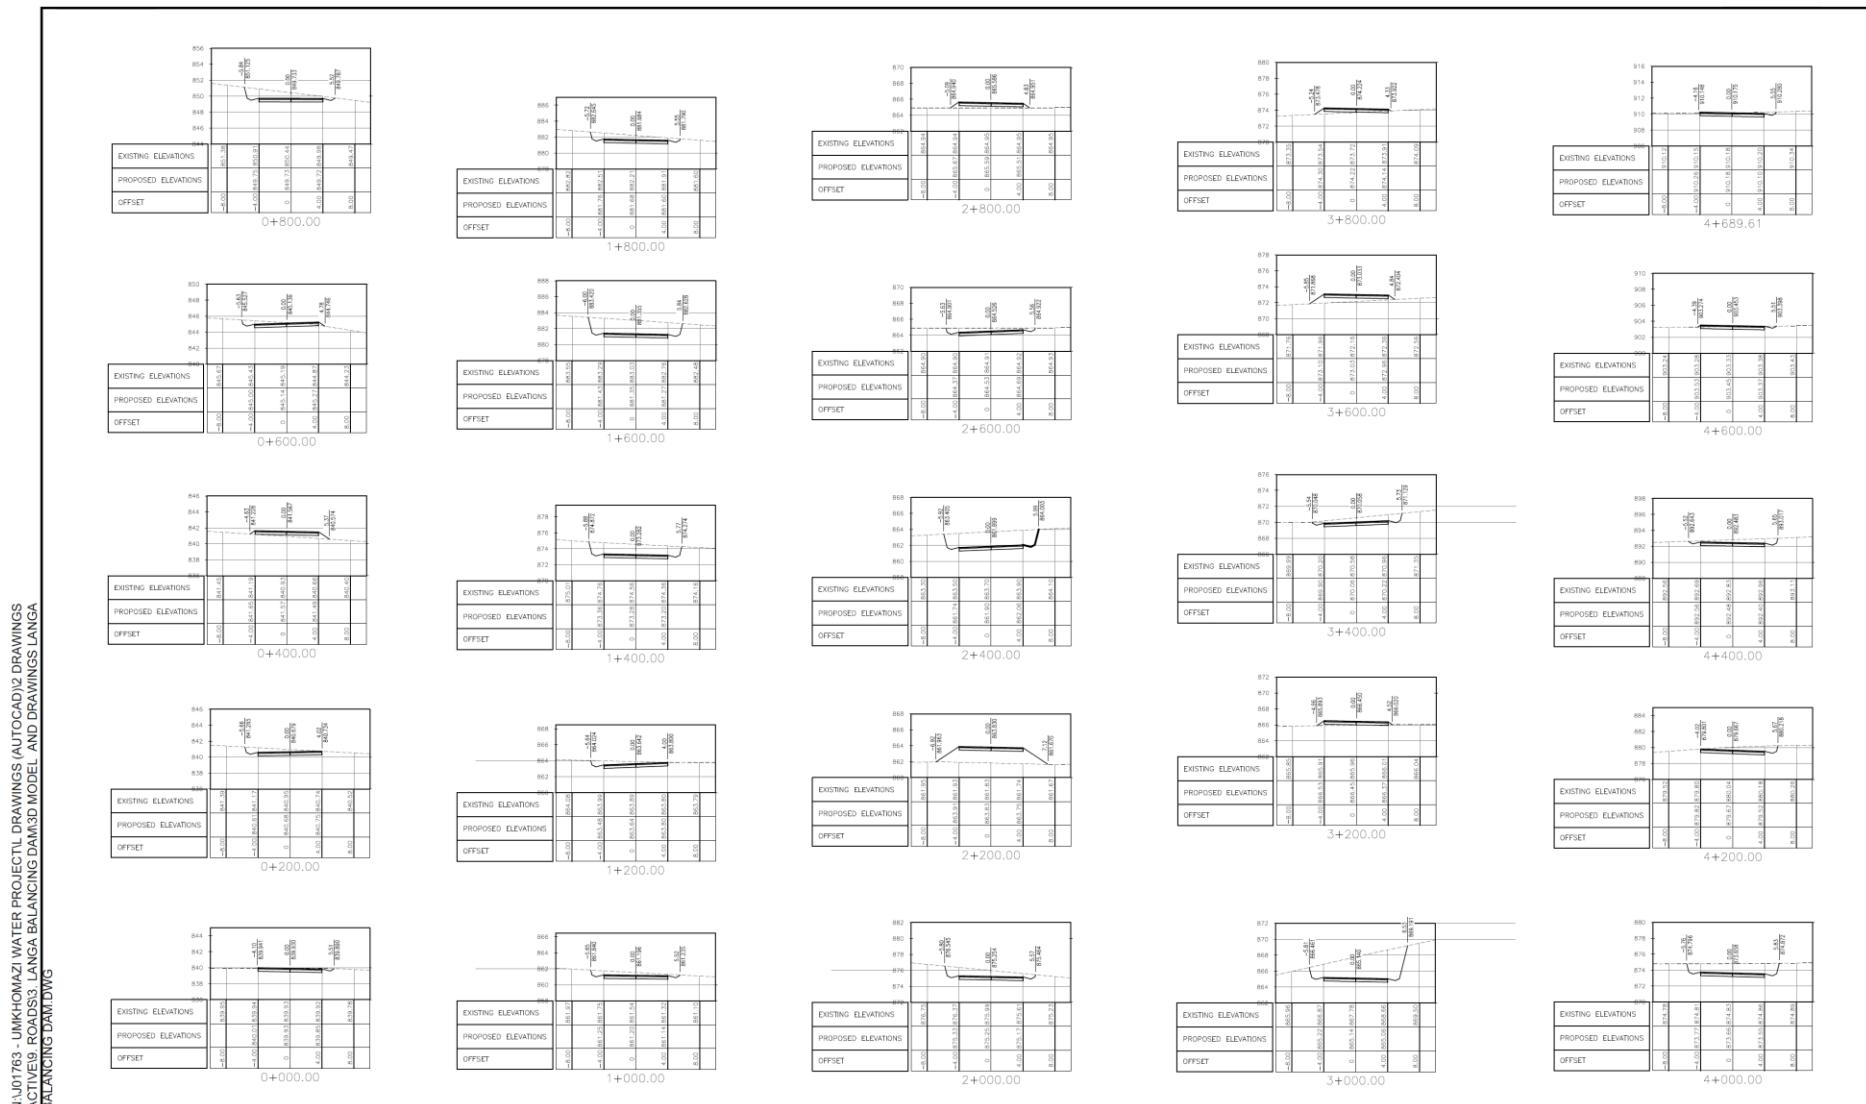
C.15: Langa Dam – Cross sections of access road to tunnel outlet portal and Langa Dam Option 2
